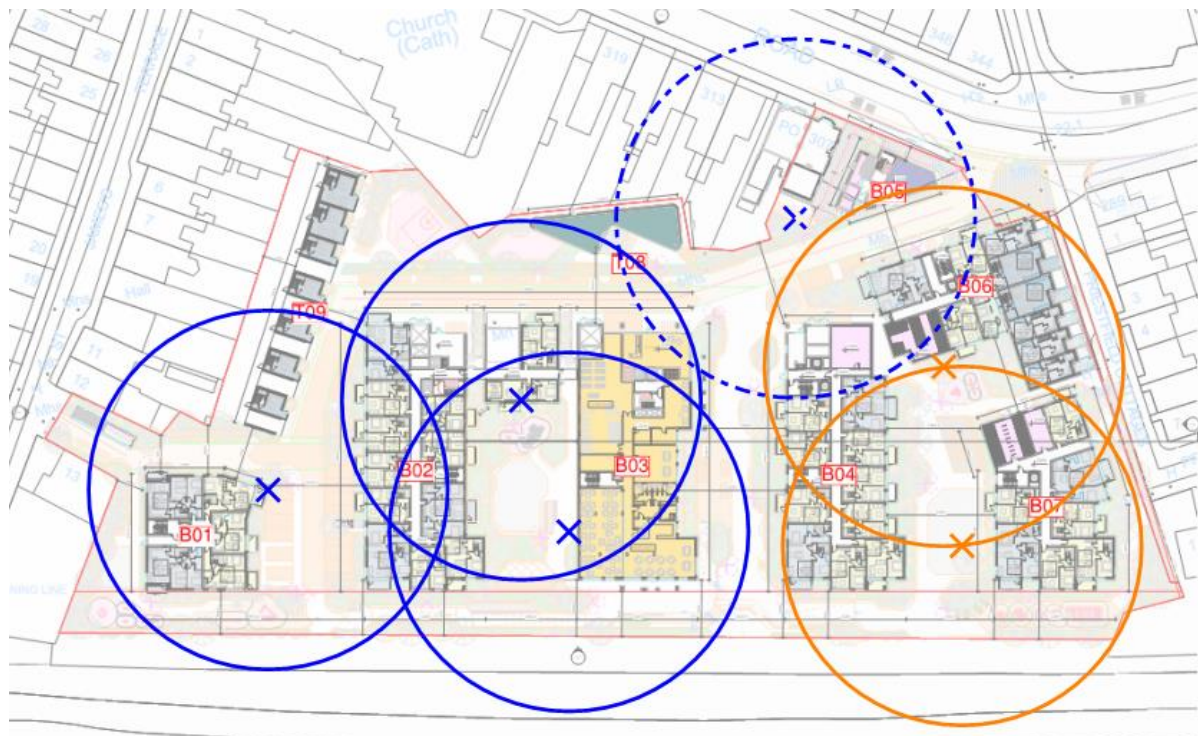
Outline Tower crane positions and lift radius (40-50m jib length)
